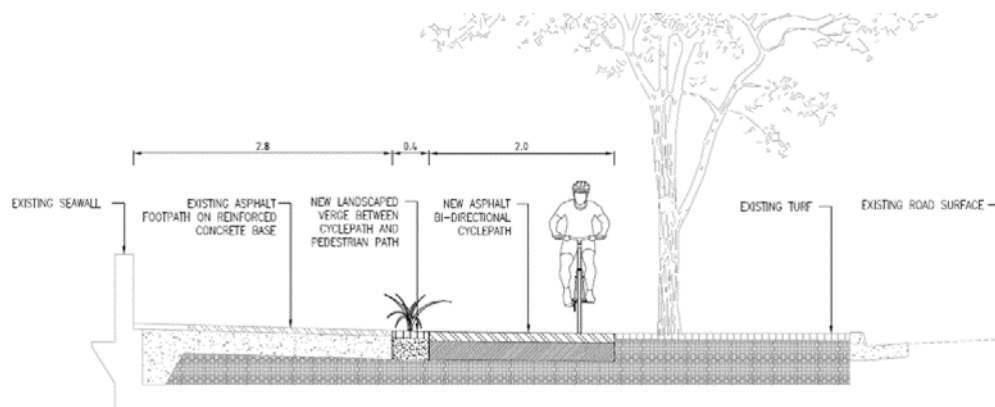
Proposed cross-section of the upgraded pedestrian path / cycle path. (Source: New South Head Road – Cycleway Upgrade: Traffic and Parking Report, April 2019)
